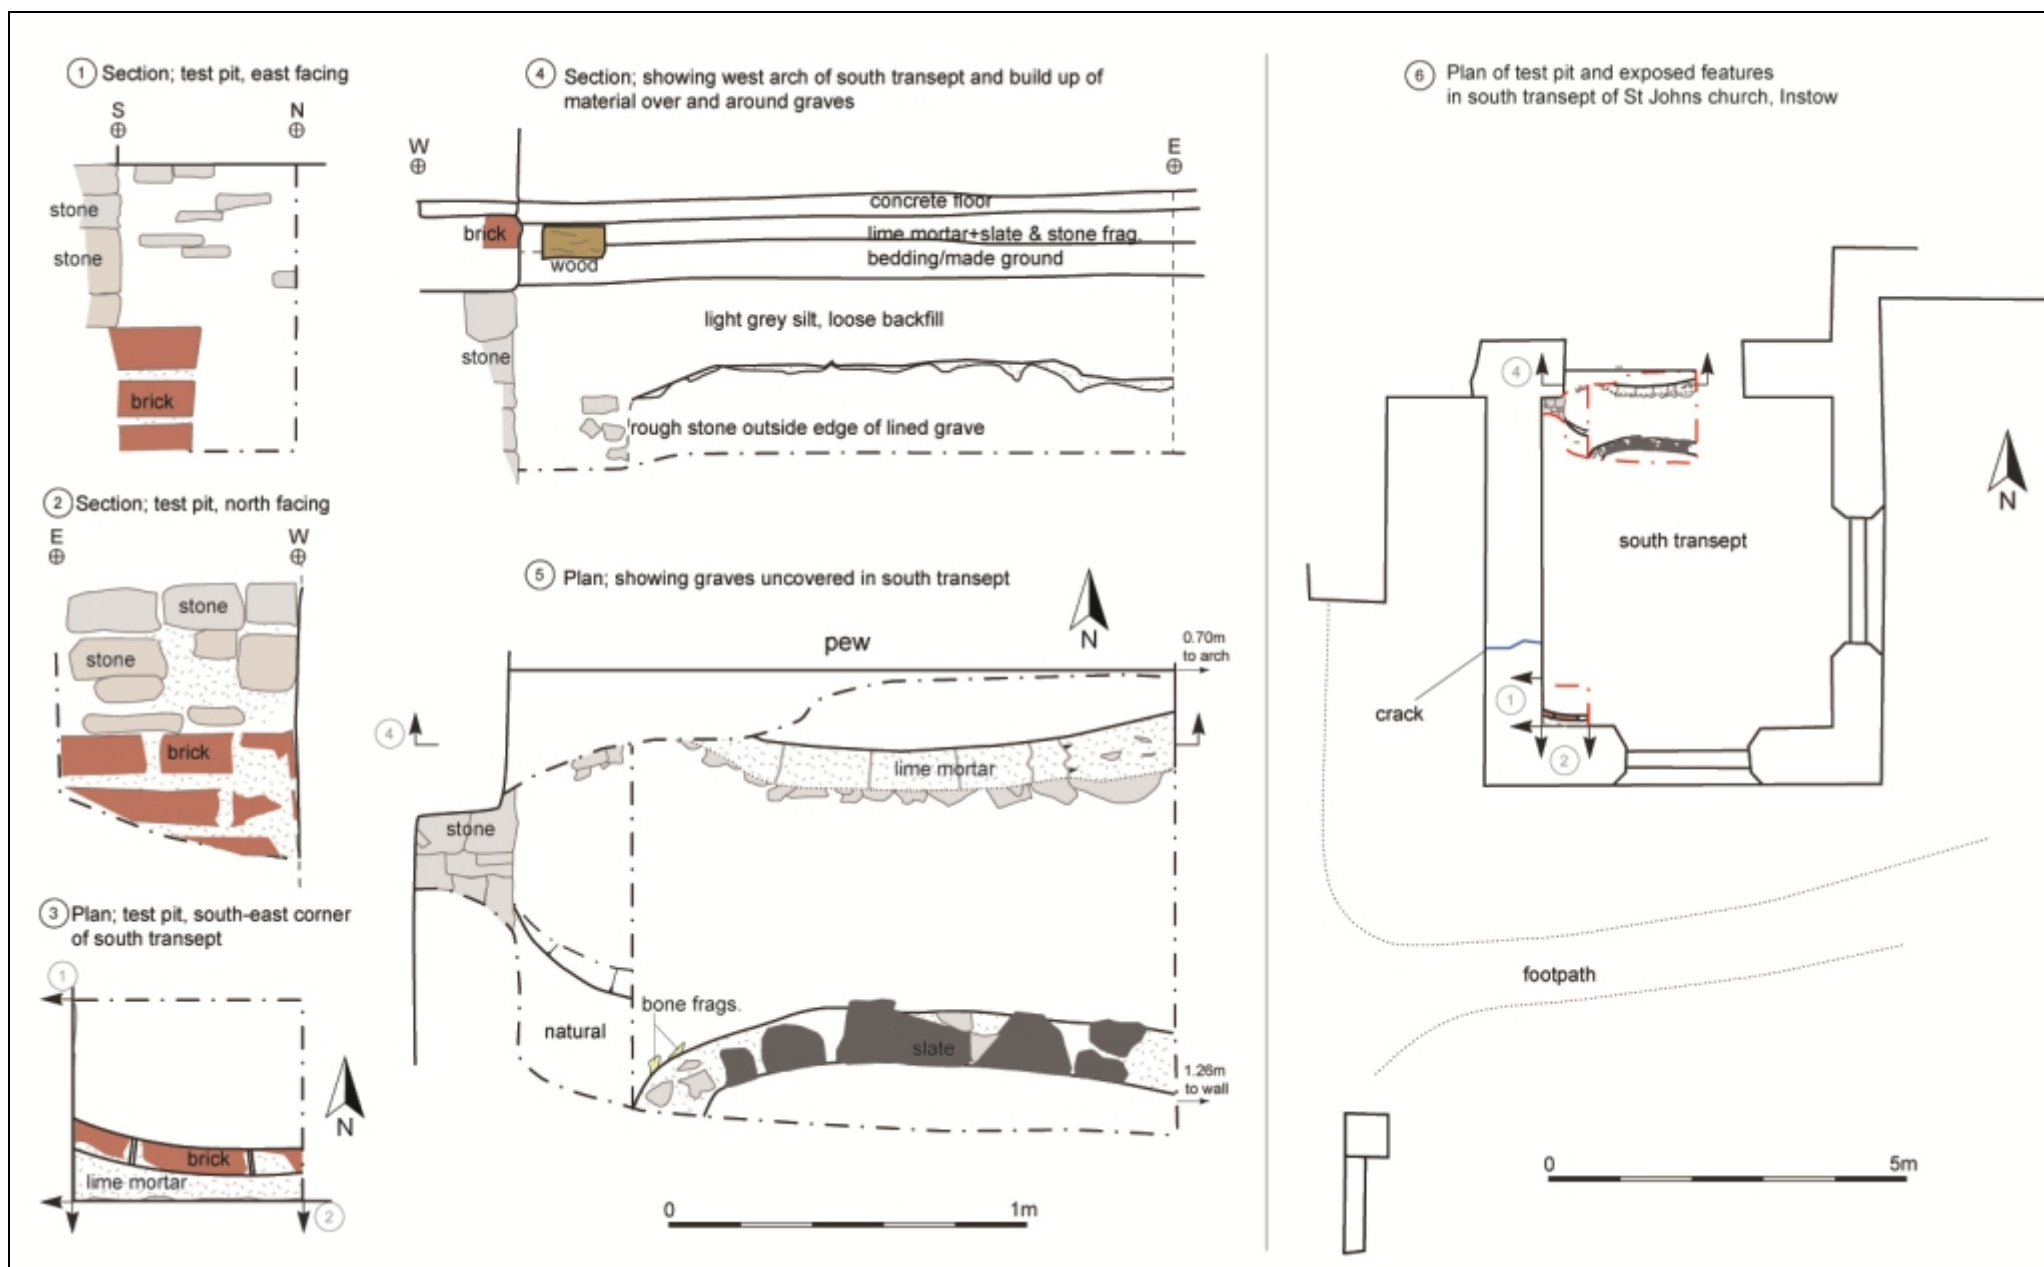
Site drawings; plan and sections. Section drawing numbers (1, 2 & 4) correspond to grey-scale numbers on plans (3, 5&6).
